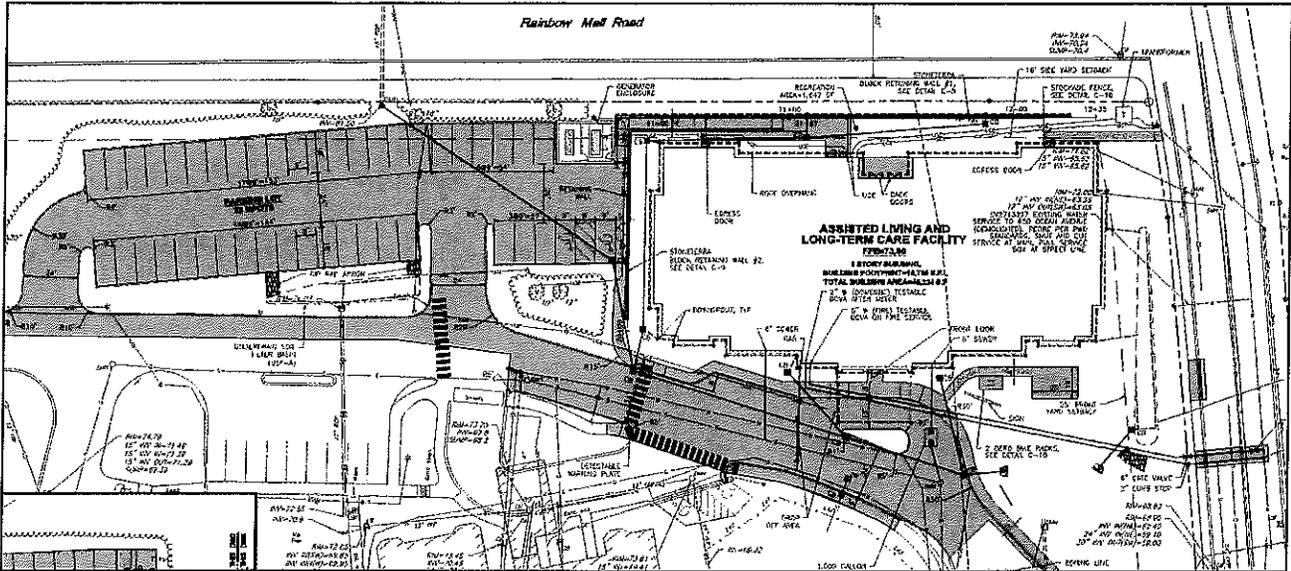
Proposed site plan showing parking lot reconfiguration, utility connections and pedestrian infrastructure improvements
